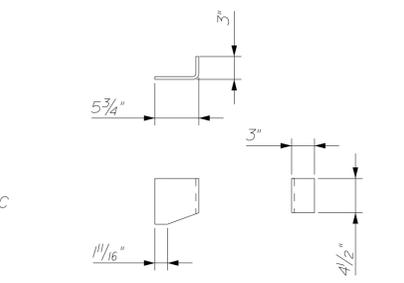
FLOORBEAM KNEEBRACE TYPE A CURB CONNECTION BENT PLATE
